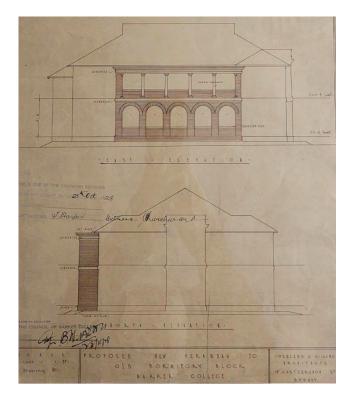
East and north elevations for 'Proposed New Verandah to Old Dormitory Block', prepared by Joseland & Giling, architects, and signed by contractor J. Harper on 25 October 1928. (Source: Barker College Archives, Plan M0006).
